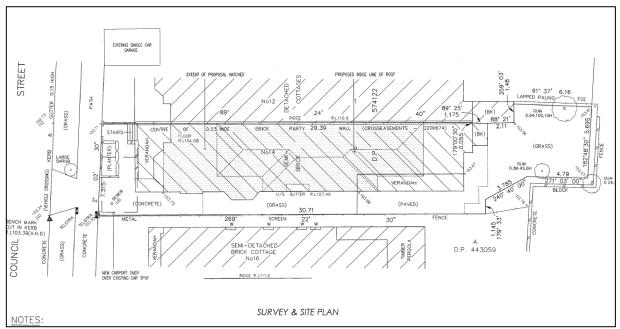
Submitted Survey and Site Plan for LD-319/2002, received by Council on 8 July 2002. Showing the existing driveway and concrete hardstand located on the subject site.
